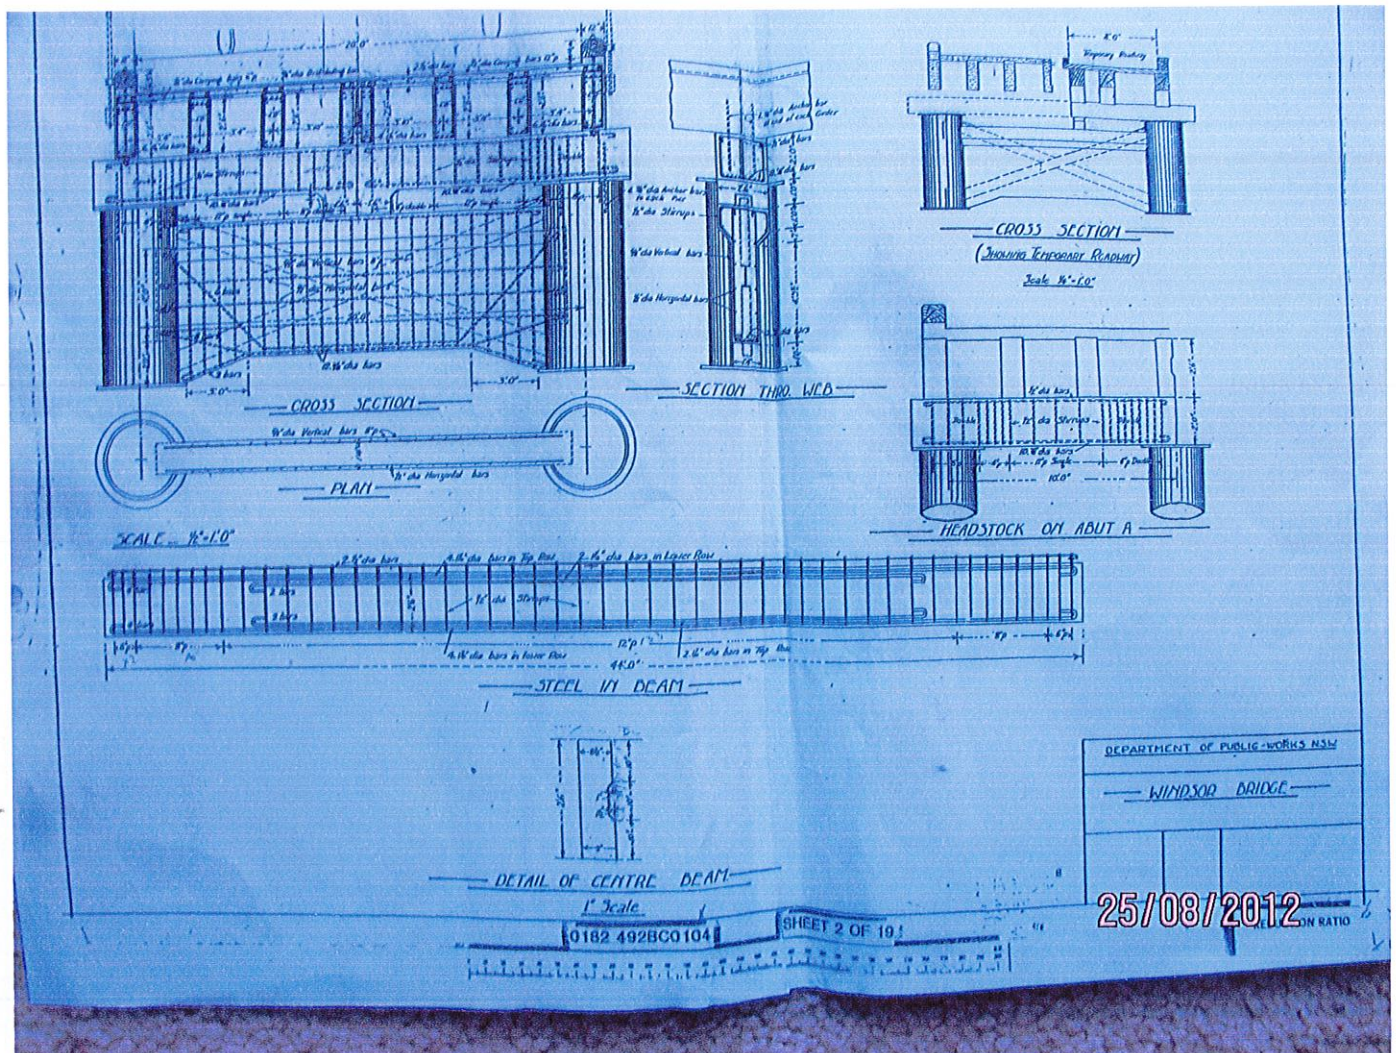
Public Works Plan for Windsor Bridge Superstructure Replacement – note split central beam for half width construction
